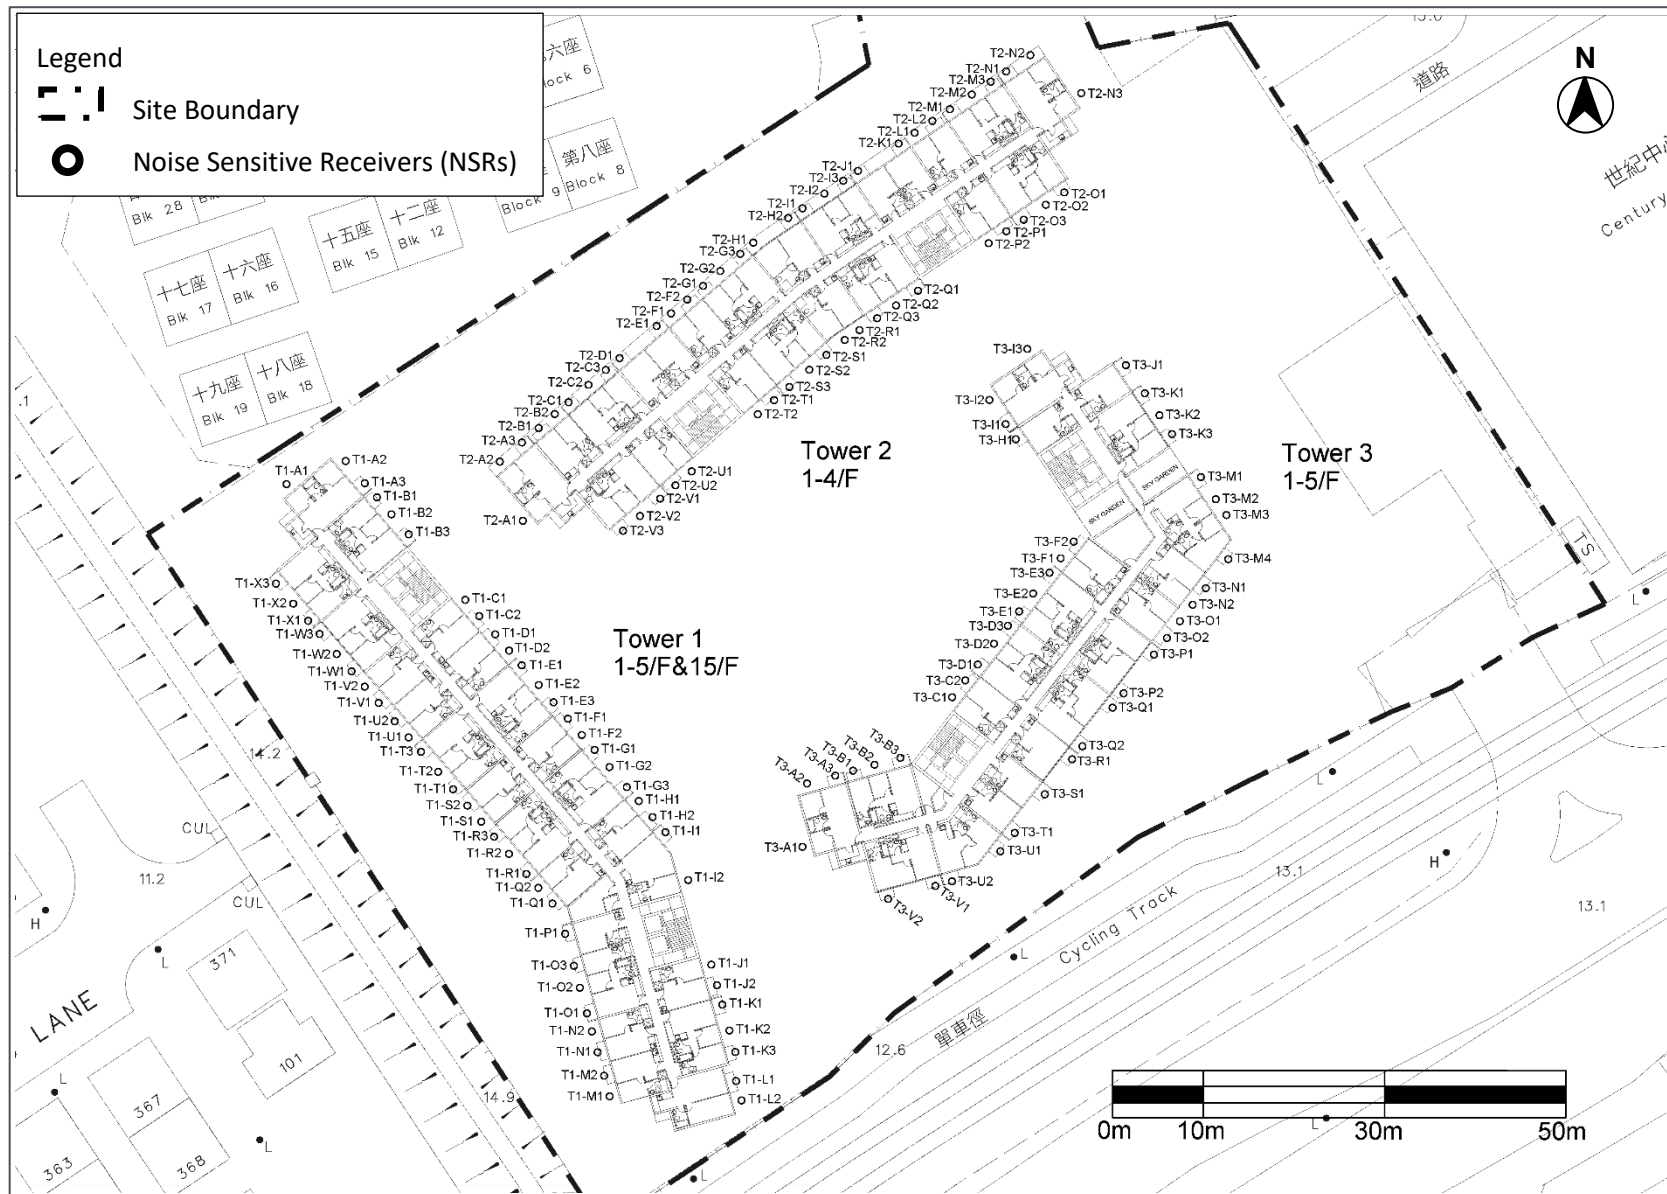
Location of Assessment Points for Noise Sensitive Receivers on Typical Floor B
